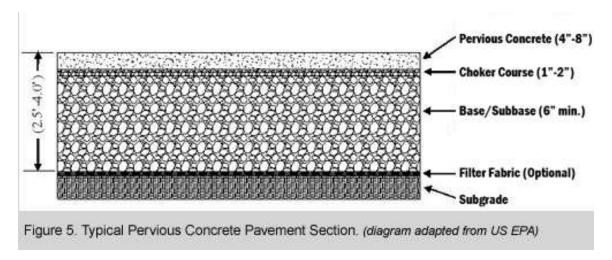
Typical Pervious Concrete Cross Section (Source: U.S. EPA, 2006)
